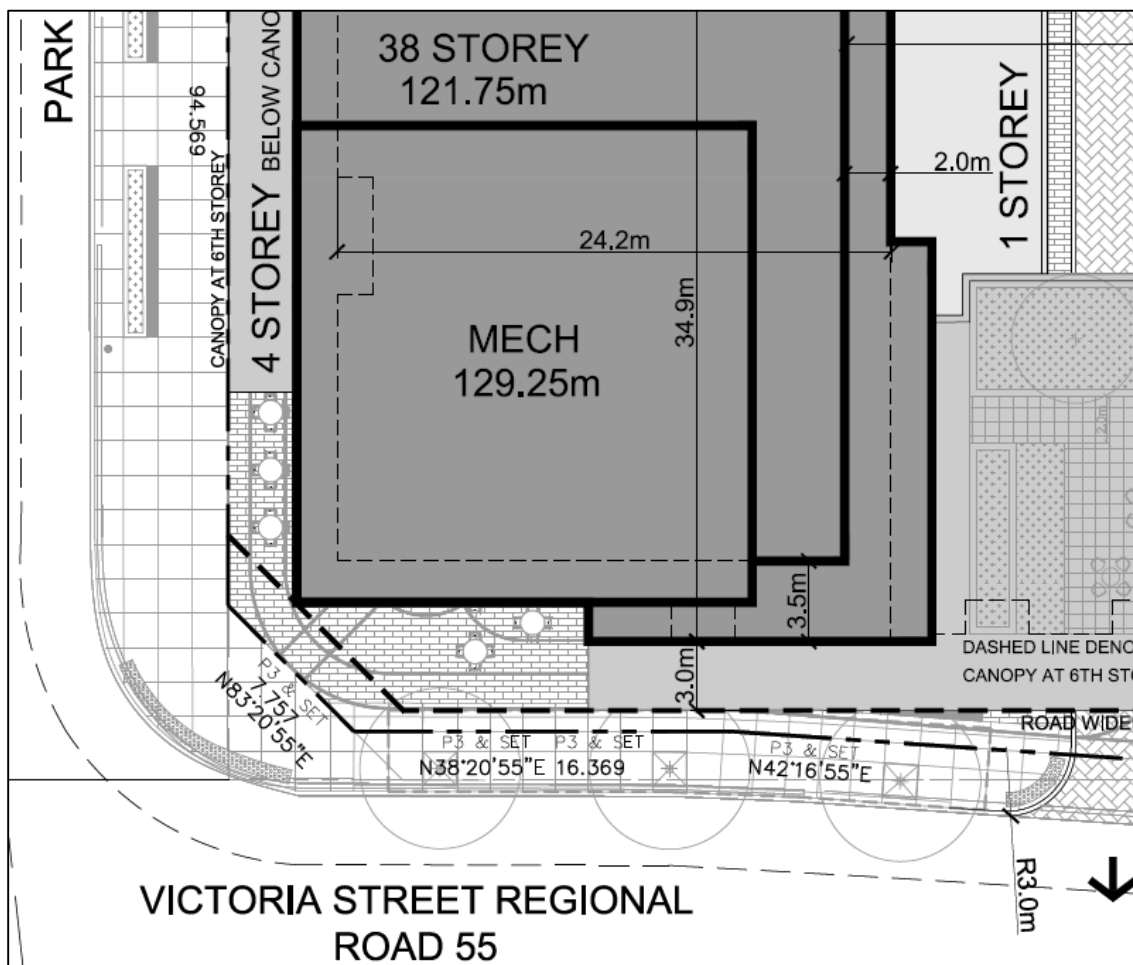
Site Plan Drawing showing Daylight Triangle, Sidewalks, and Pedestrian Plaza
